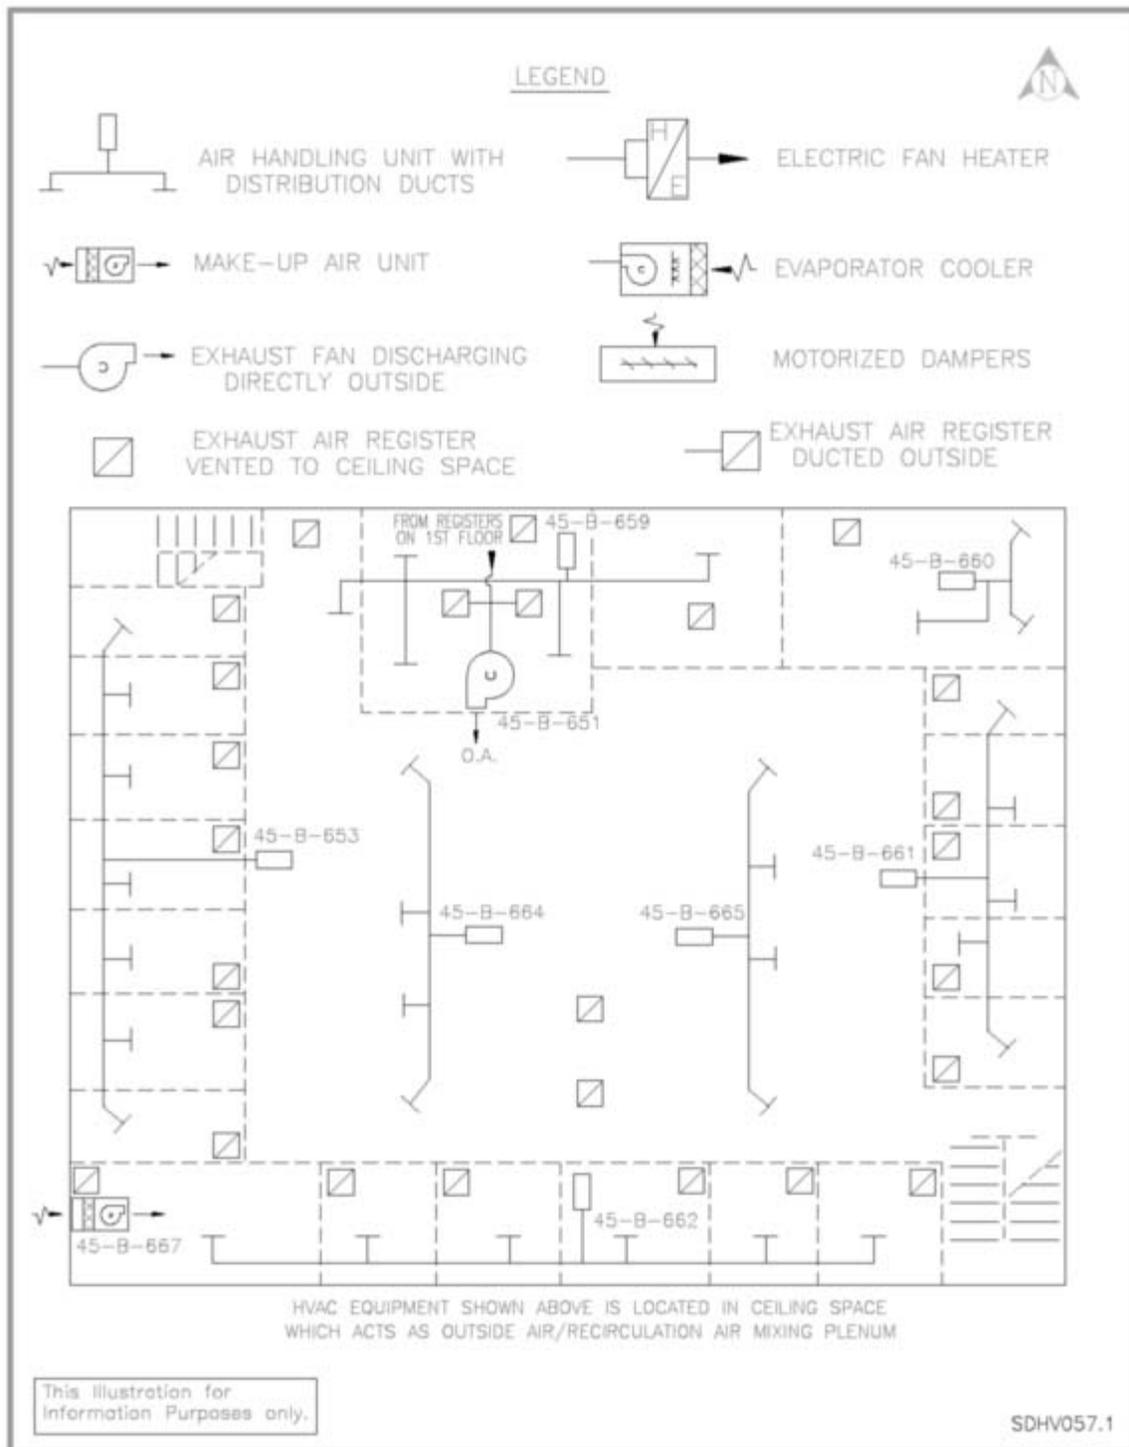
HV05 S&E Building Second Floor HVAC Block Diagram
